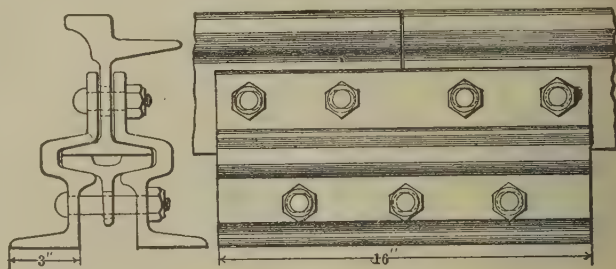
STANDARD GIRDER JOINT FOR HIGH RAIL.
